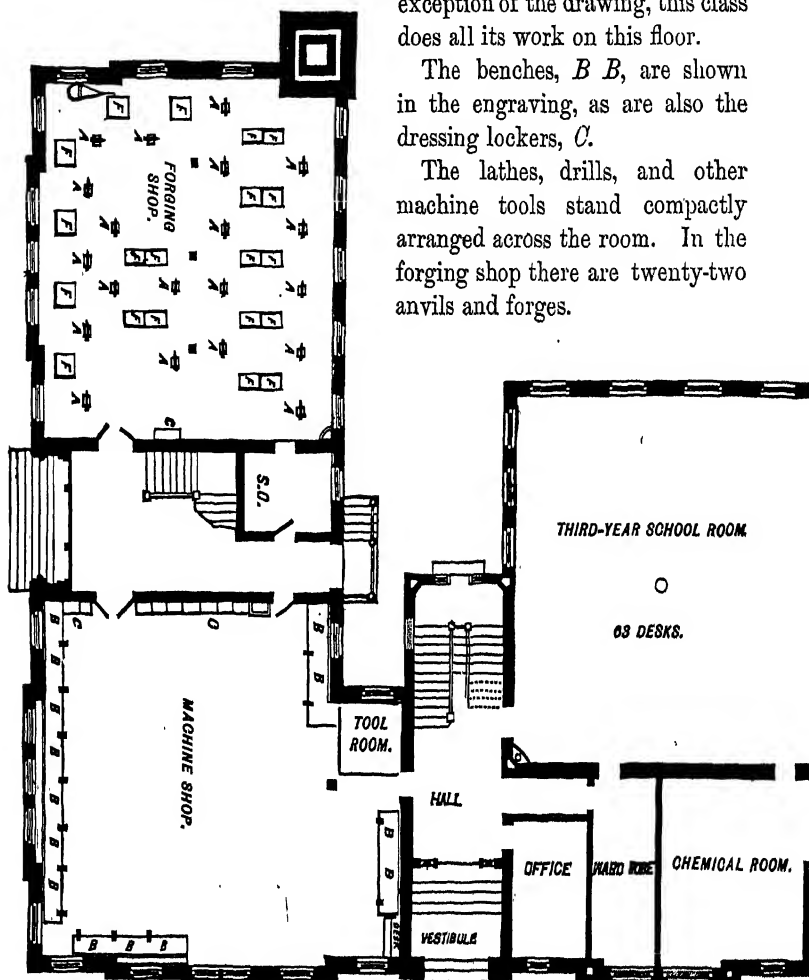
ST. LOUIS MANUAL TRAINING SCHOOL.—PLAN OF FIRST STORY.
